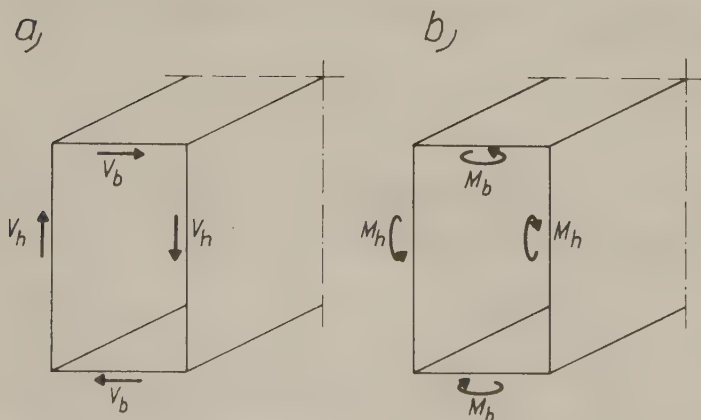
a) Box beam section subjected to shear forces.
